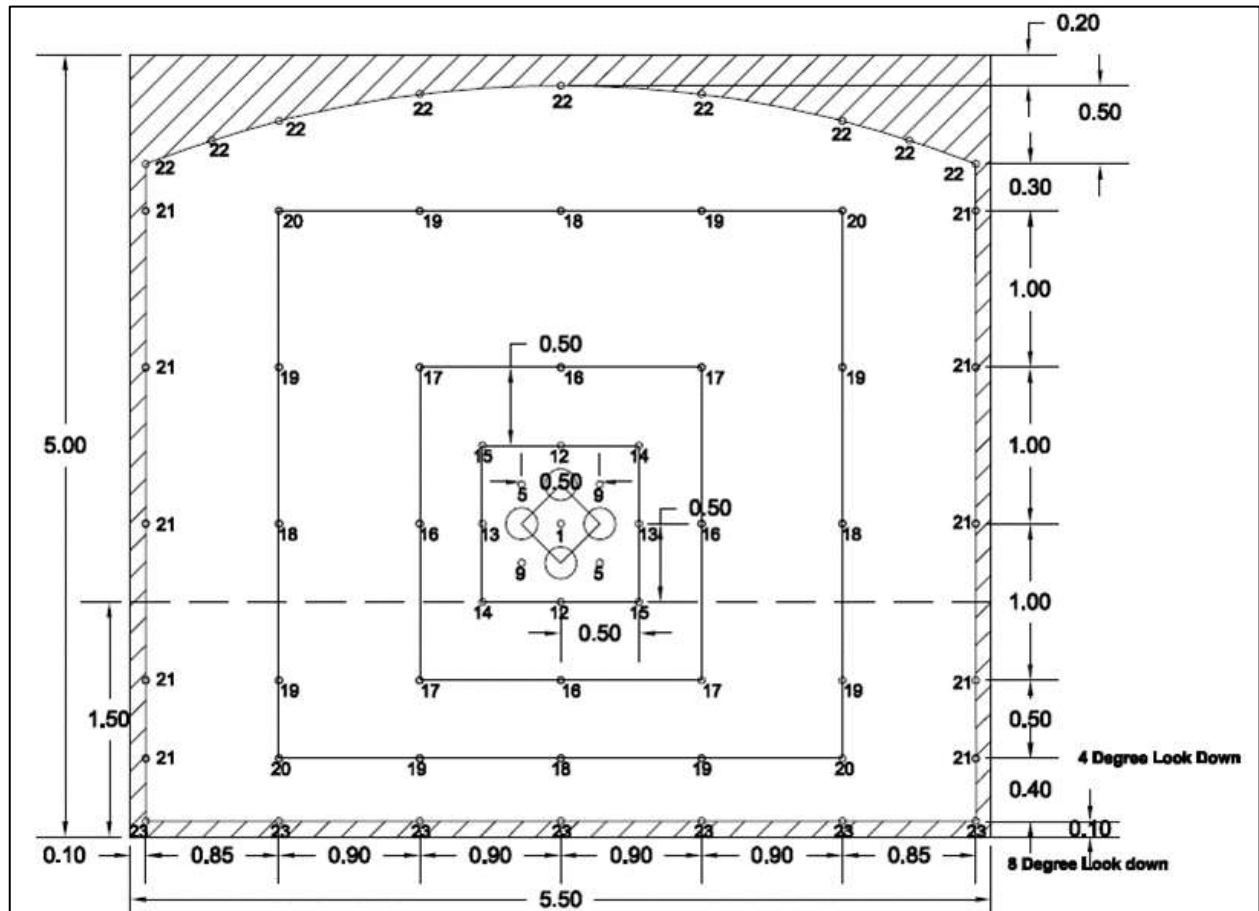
Existing blast design pattern of 5.5m x 5.0 m used at Baroi underground mine, HZL.
